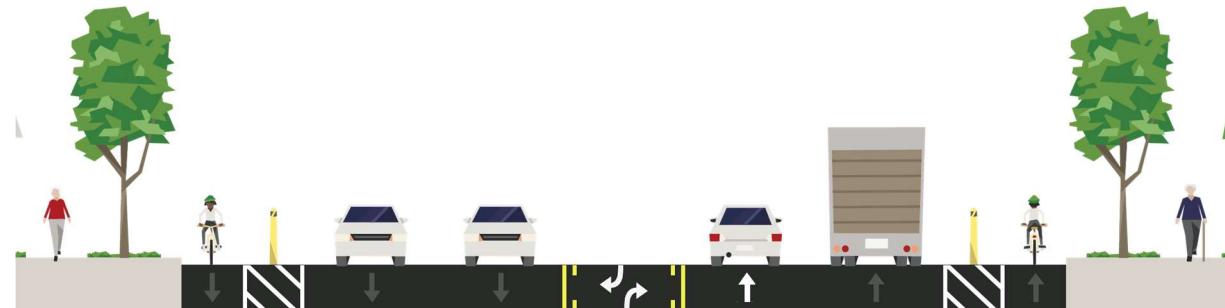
Cross Section 3 with Bollard and Removable Curb Separated One-way Cycle Track
